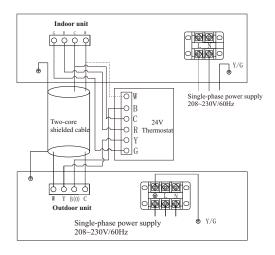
Electrical Wiring of Single-phase HP Outdoor Units
